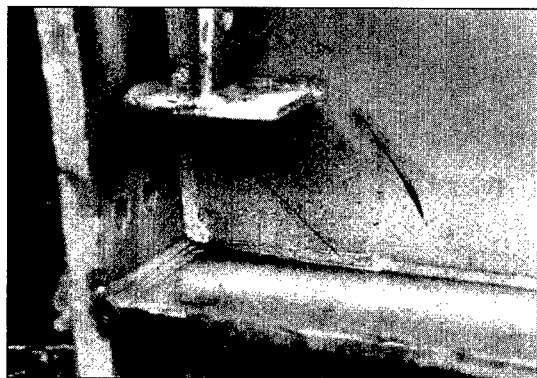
Crack in the web plate 18 mm thick between the cross-piece and flange
